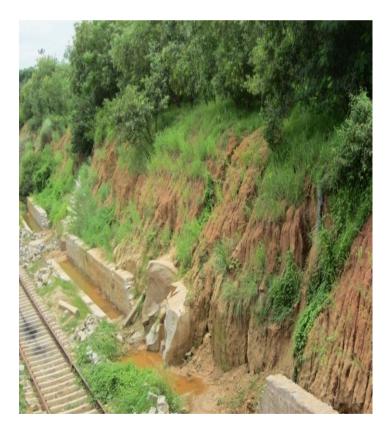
Construction of toe wall & planting of *Cymbo pogon* tufts at railway siding track slope
